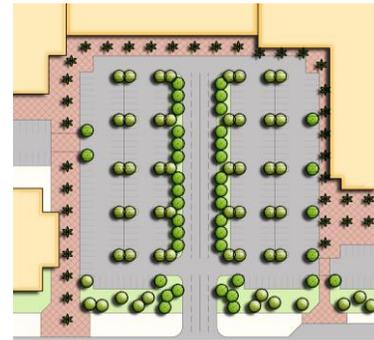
Pedestrian circulation is consistent along perimeter of parking lot.
